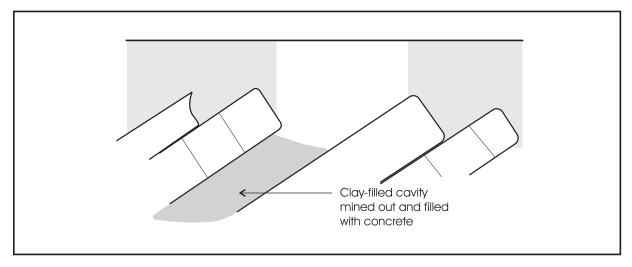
Grout in Open and Clay Filled Rock Cavities
